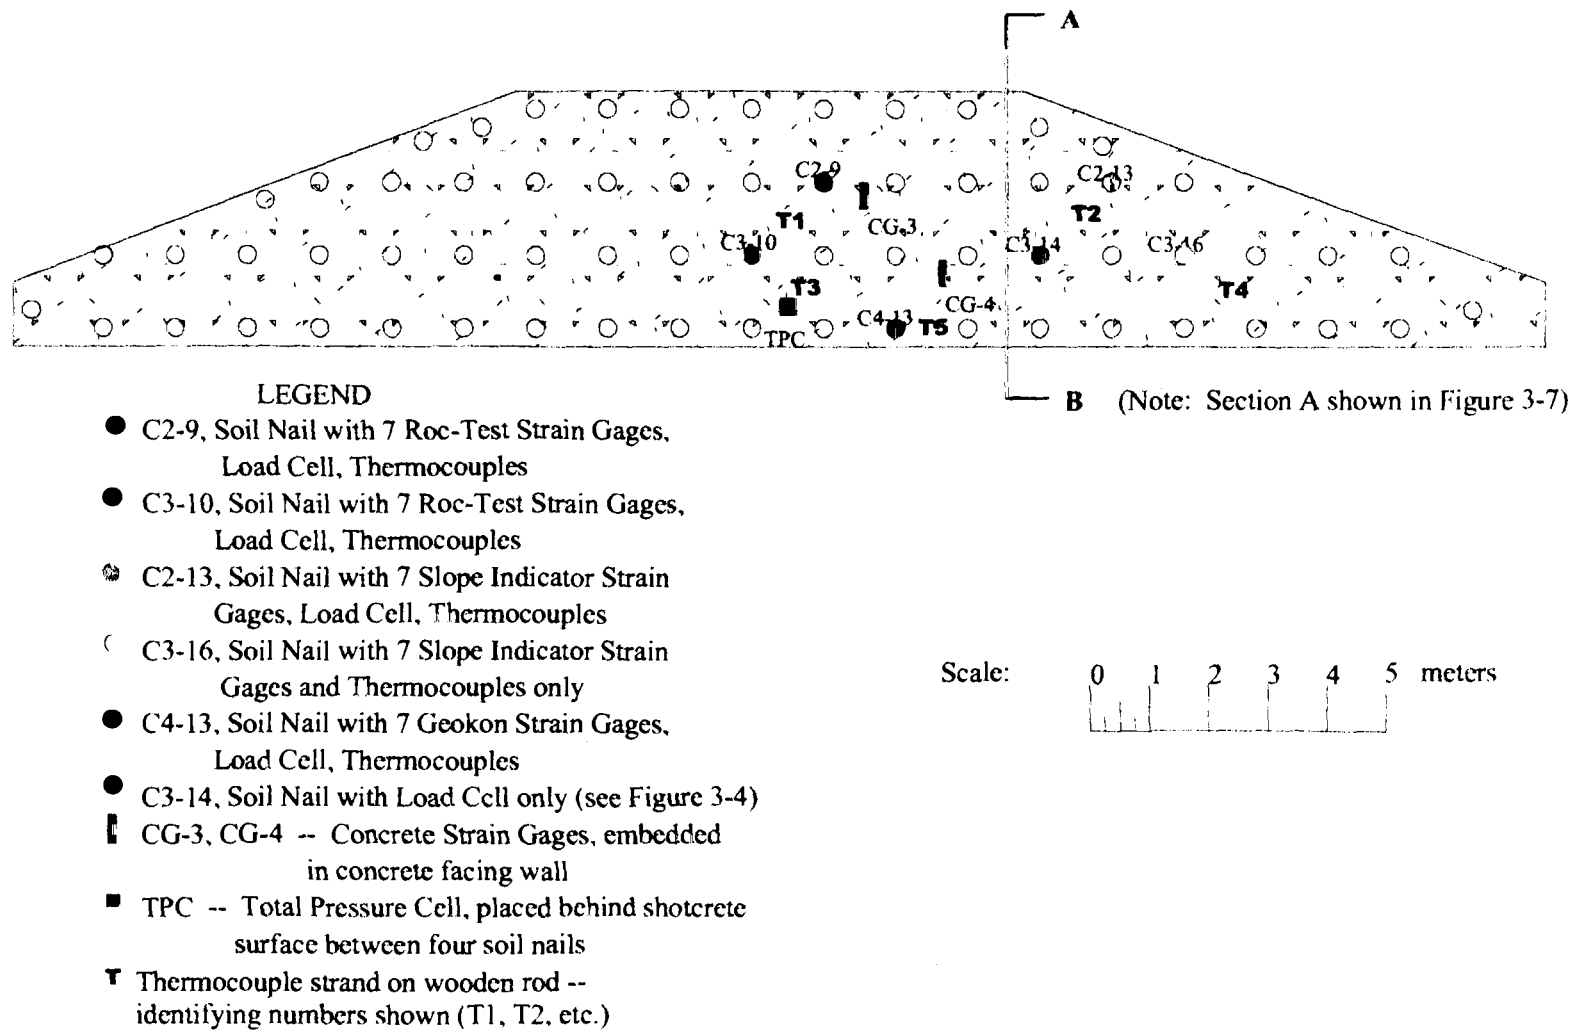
Profile of instrumented north-facing soil nail wall, Brunswick-Topsham Bypass
